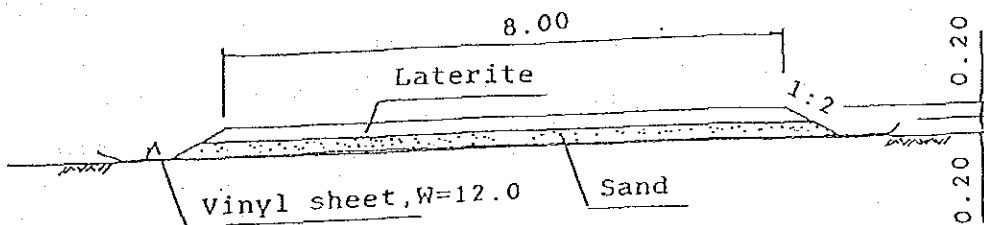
(B) Typical Section of Access Road (Type 2)
